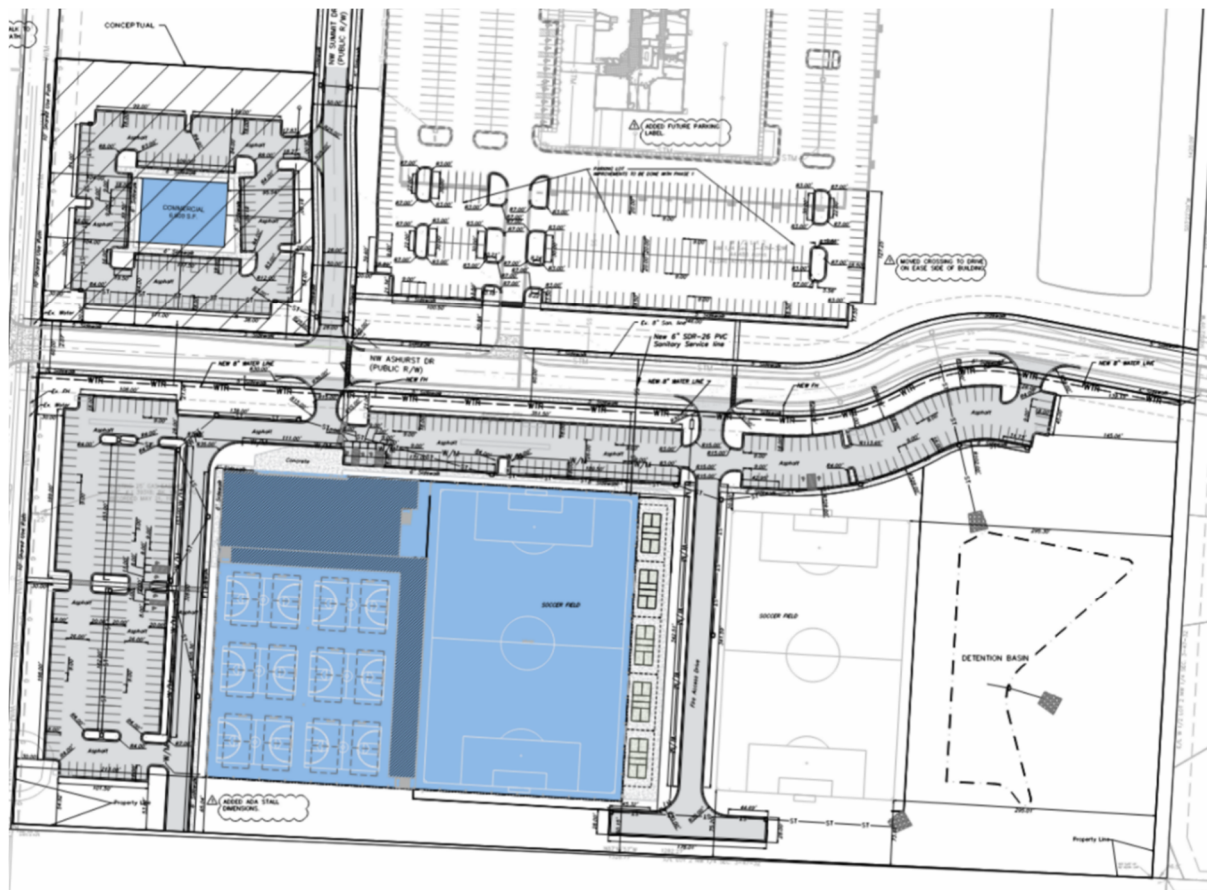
Preliminary Development Plan (sports complex and parking lot expansion); Conceptual Development Plan (commercial site) shown with hatching.
